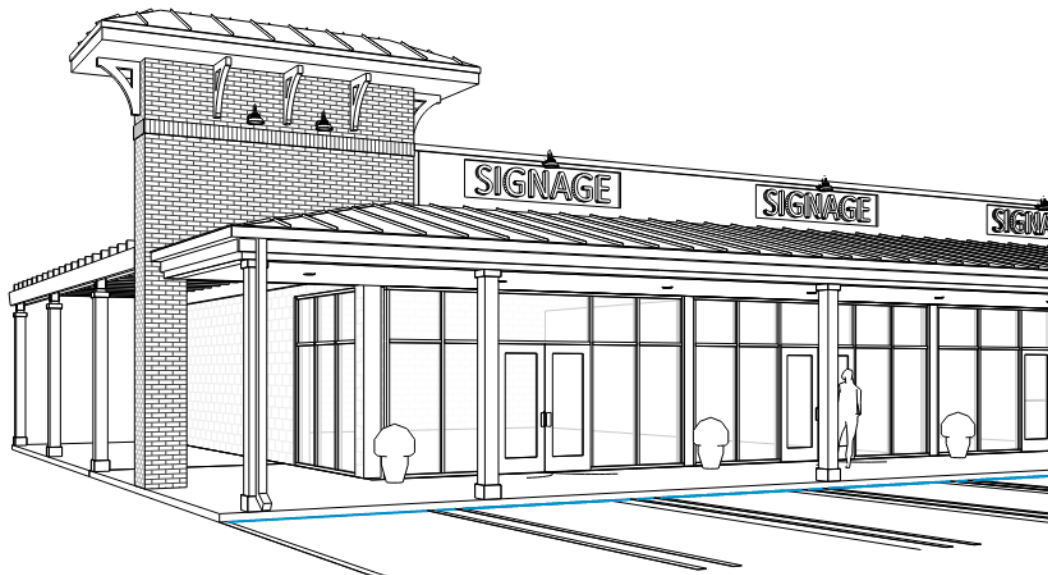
Sketch of Decorative Element at Griffith Street Corner
